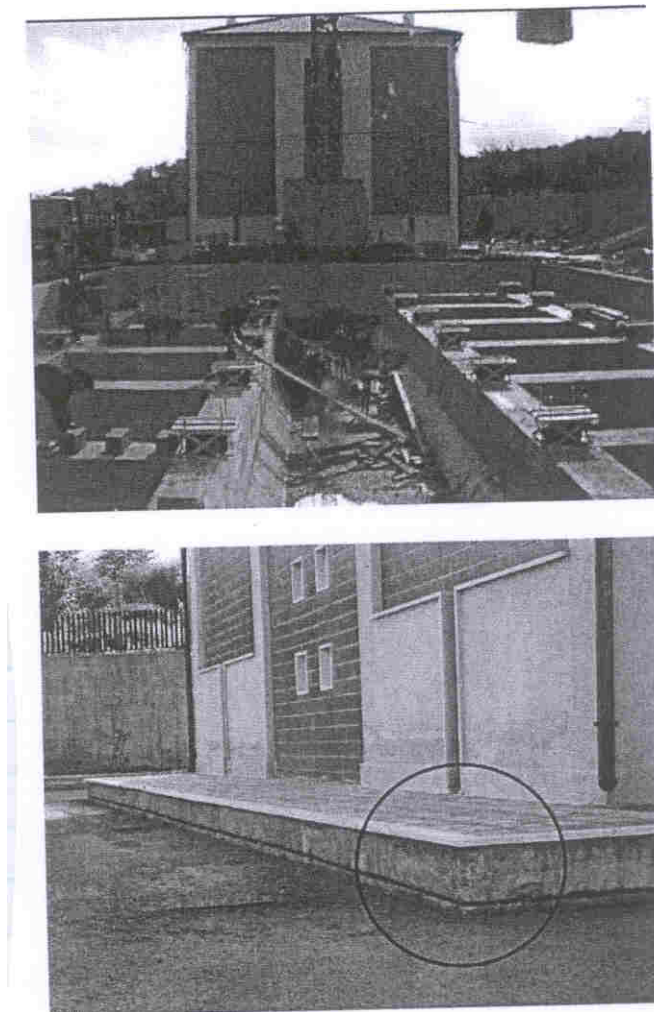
Foundation of building 'A' and vertical gap for isolation.
